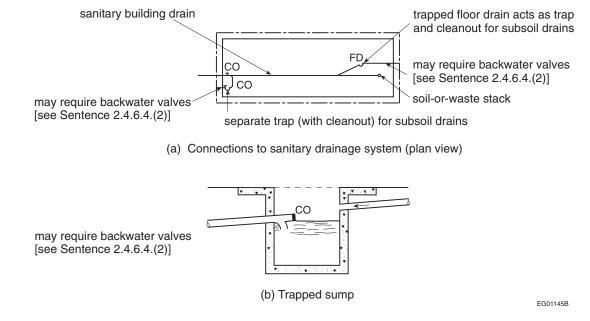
(1) Subsoil Drainage Connections
